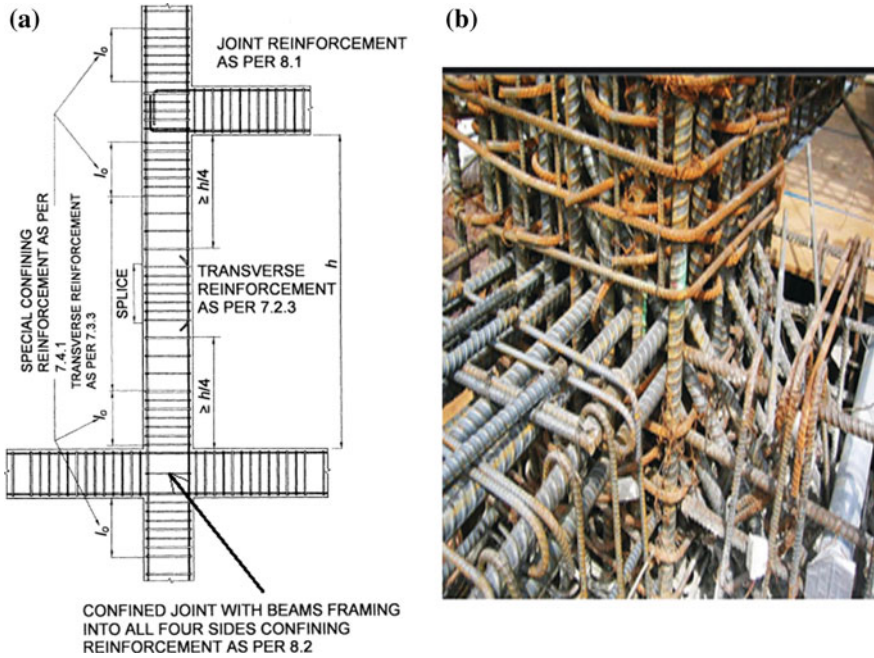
a Typical ductile detailing IS 13920-2016 [7]. b Reinforcement steel congestion at beam-column joint
